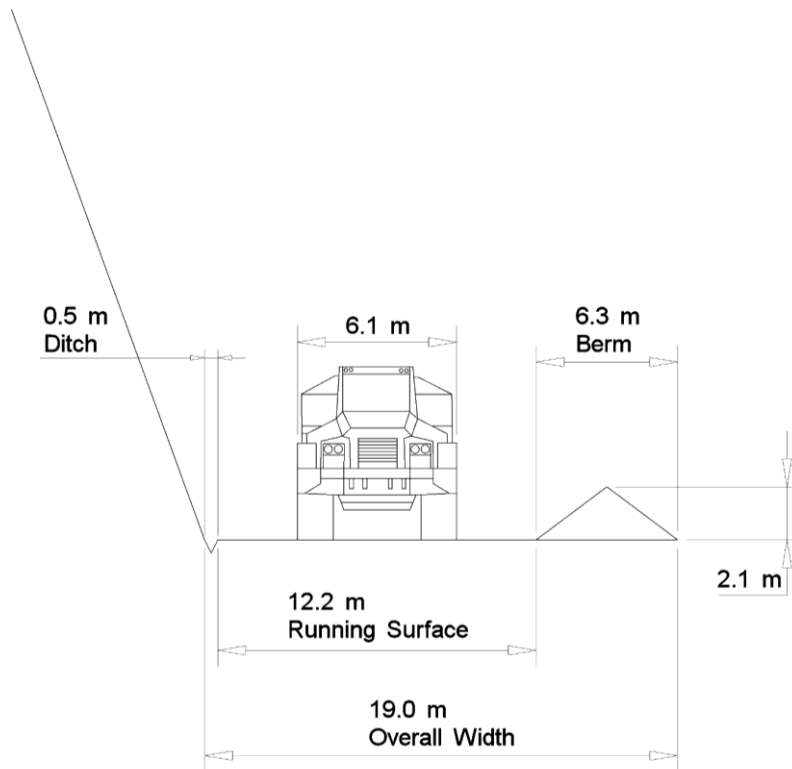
Cross-Section of Pit Ramp (Assuming no larger than a 100-t Haul Truck is Used)
